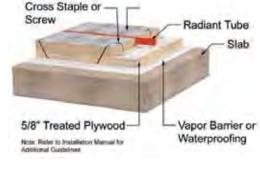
Concrete Floating with Insulation Adhere % Barrier insulation (R2) or 1" Ultraboard (R5) foam insulation to slab prior to applying plywood.
